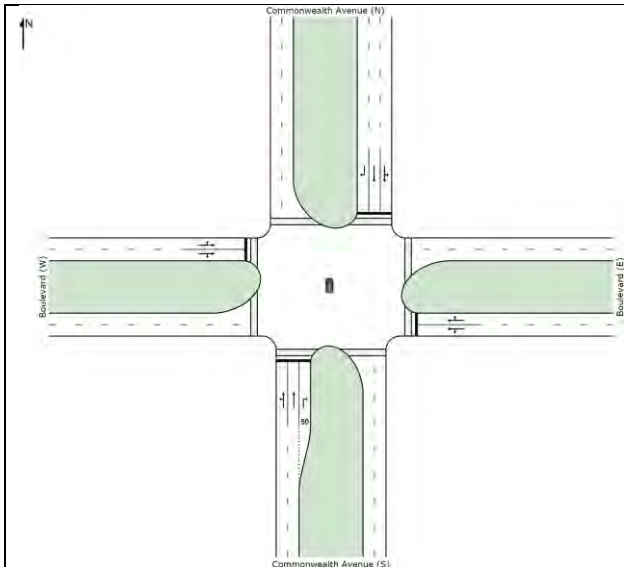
UDS Feasibility Design Parkes Way Boulevard – Commonwealth Avenue Intersection
